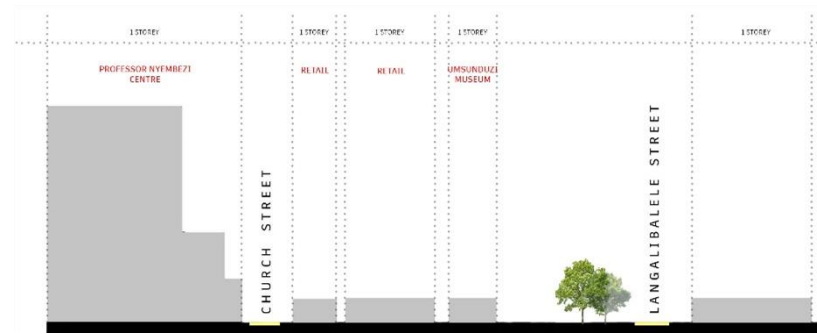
Longitudinal Sections Showing Building Masses in and Around the Core Civic Block
